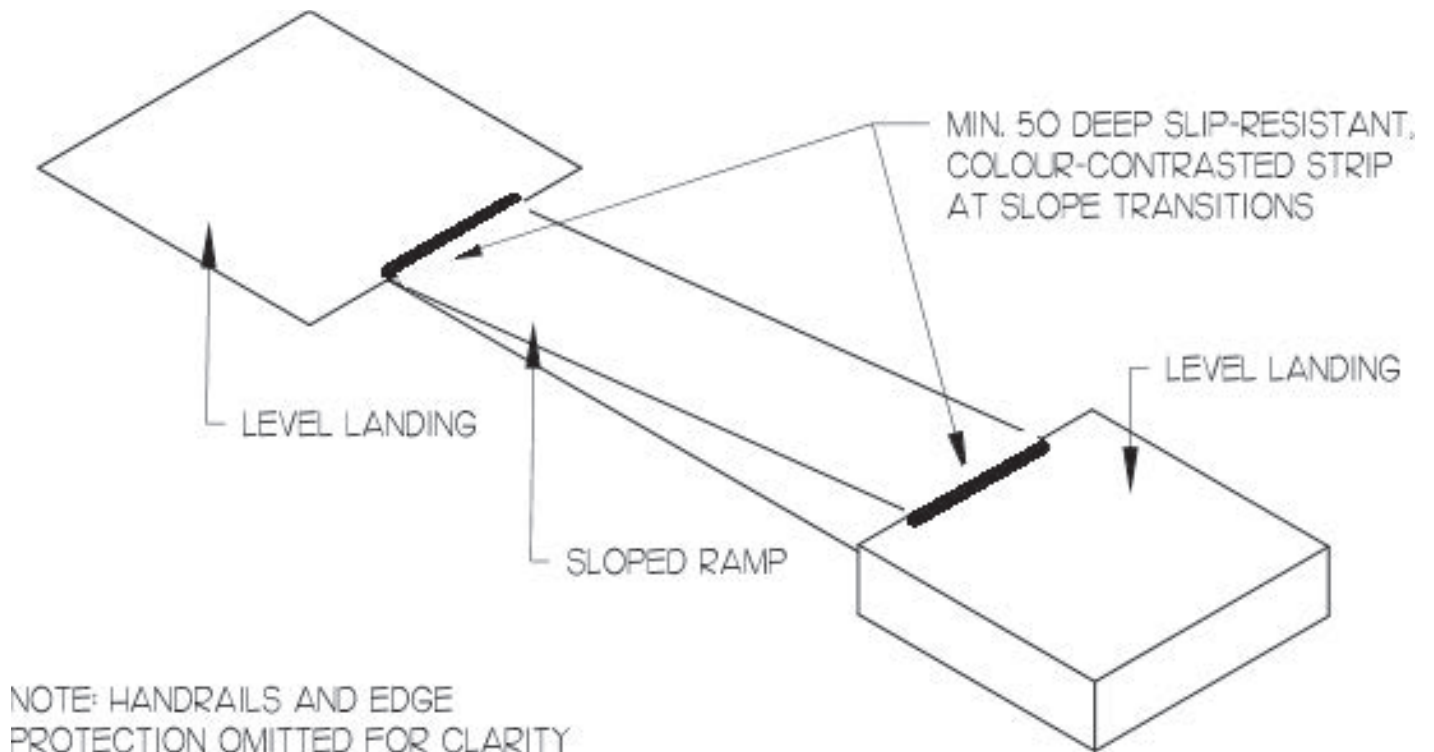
Location of Luminance (colour) contrast Strips at Ramp Slope Transitions
